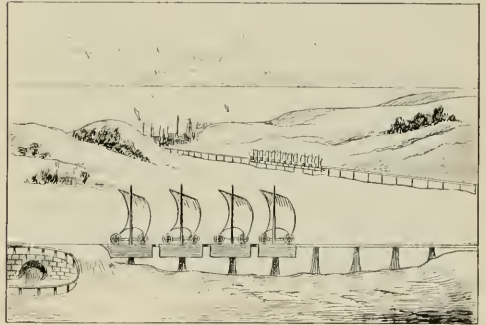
ELEVATED SINGLE TRACK ROAD.
